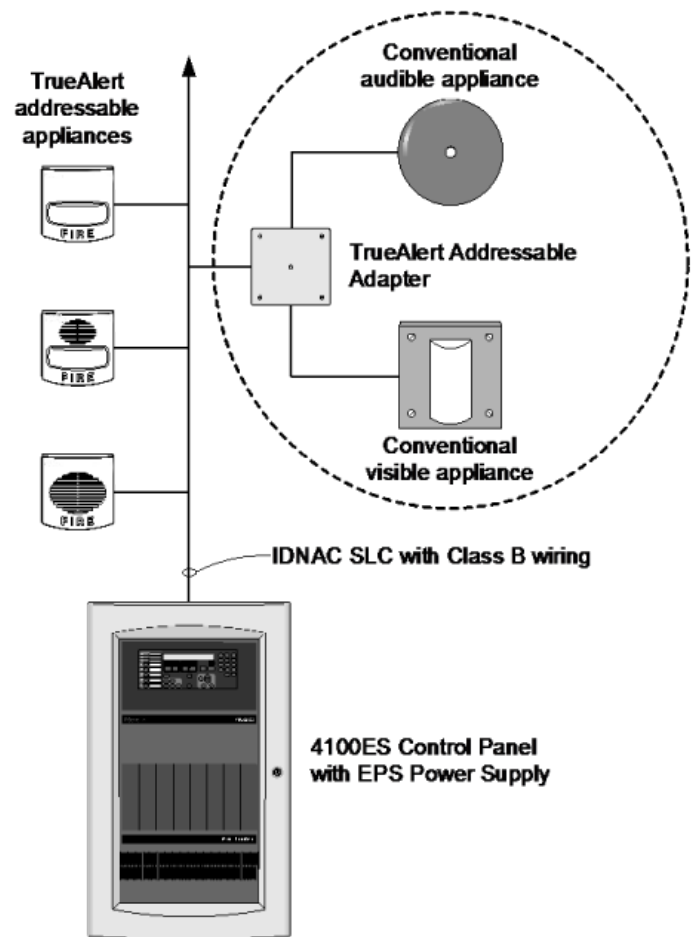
TrueAlert Addressable Adapter Module, Typical One-Line Wiring Reference
